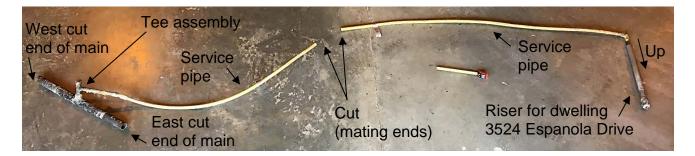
As-received riser and service pipe for dwelling 3524 Espanola Drive that connects to the tee assembly and main.
